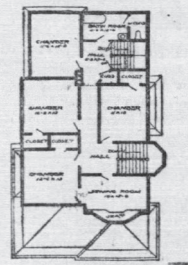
Plans of a house in the original Ladies' Home Journal of Philadelphia, 1916 (source: Plusurbia Design).
